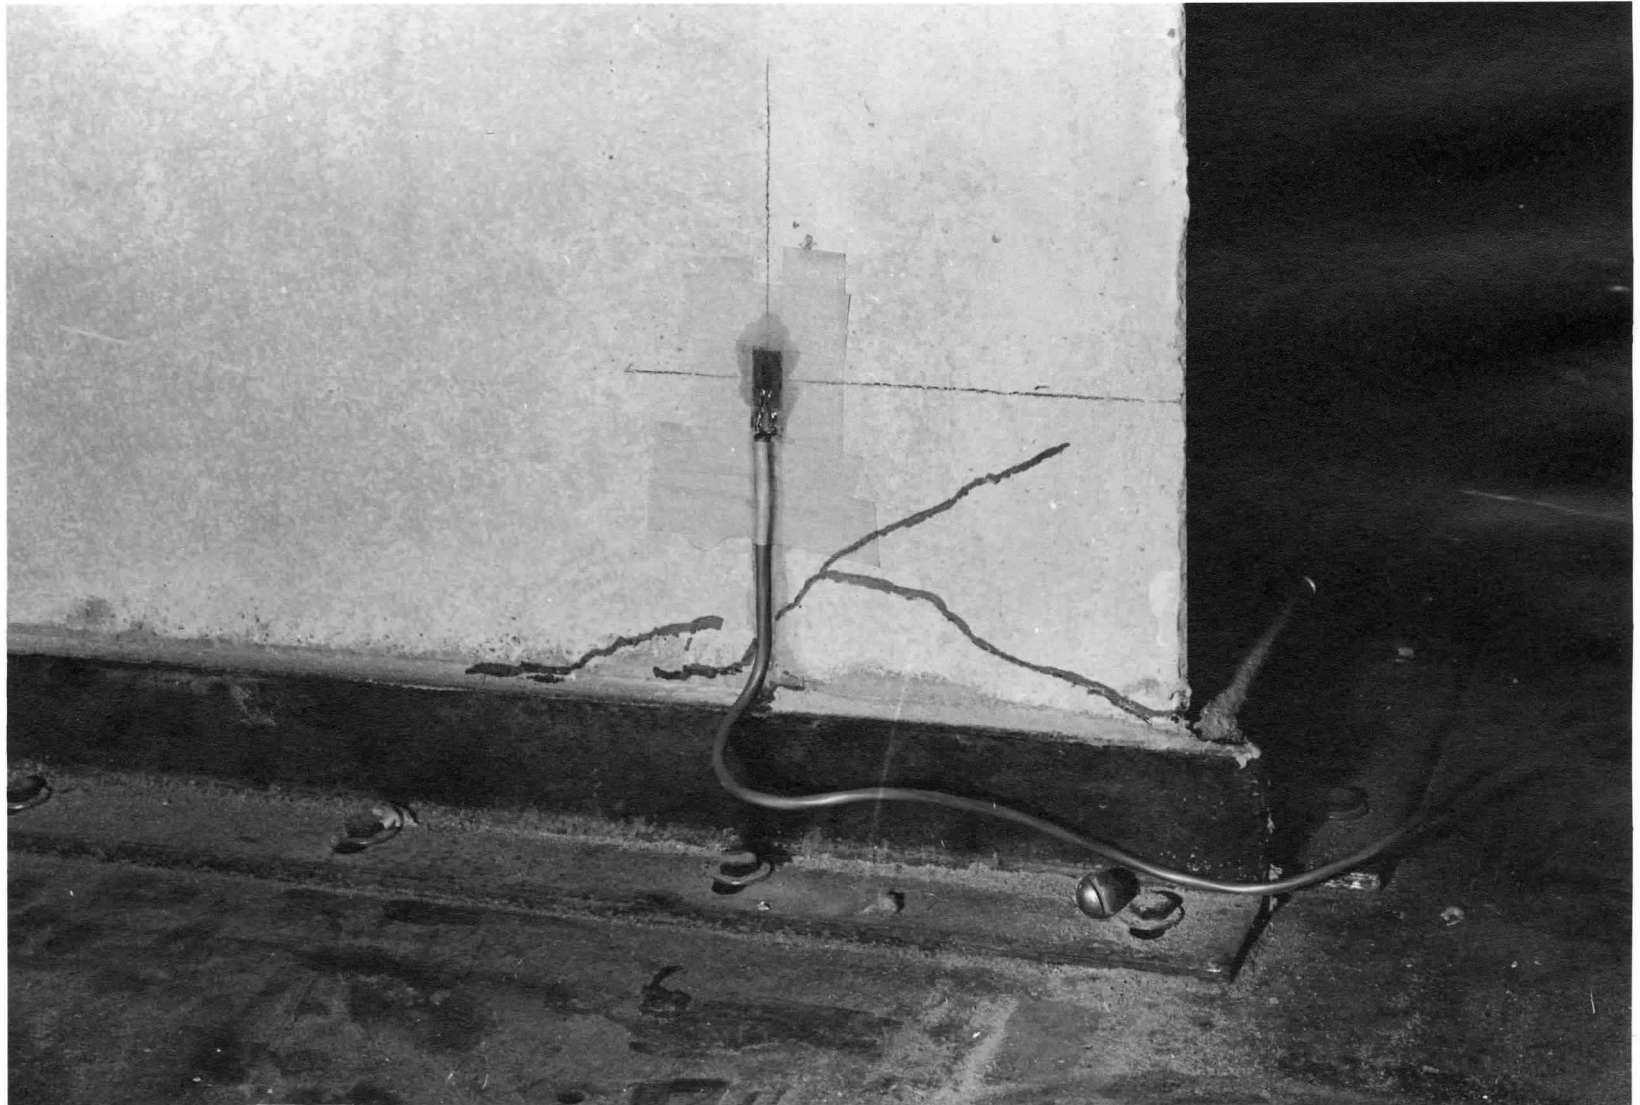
CRACKING PATTERN ON THE OUTSIDE OF CORNER C OF BUILDING 11
